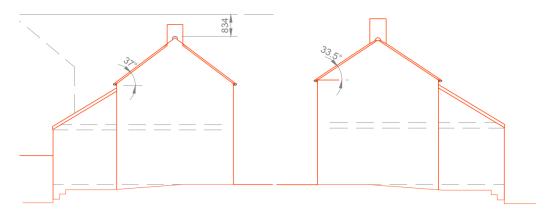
Existing north (left) and south (right) elevations showing the different pitches
